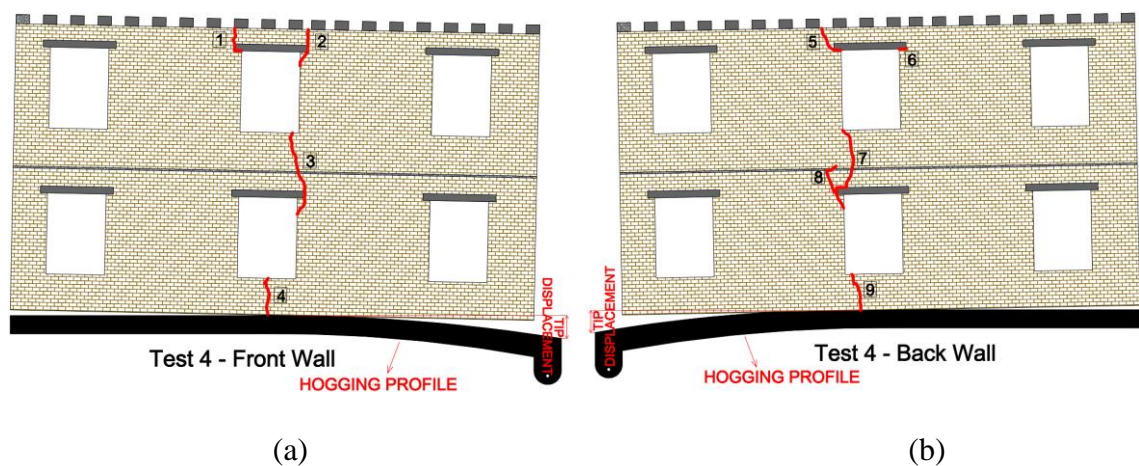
Schematic views of cracks occurred at the end of Test 4: (a) at the front wall of the joist floor, (b) at the back wall of the joist floor.
